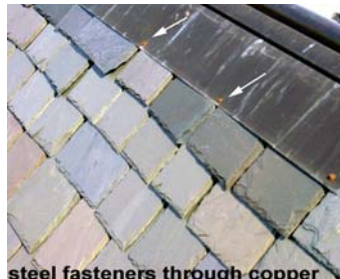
Steel fasteners on copper, as shown, will deteriorate.
